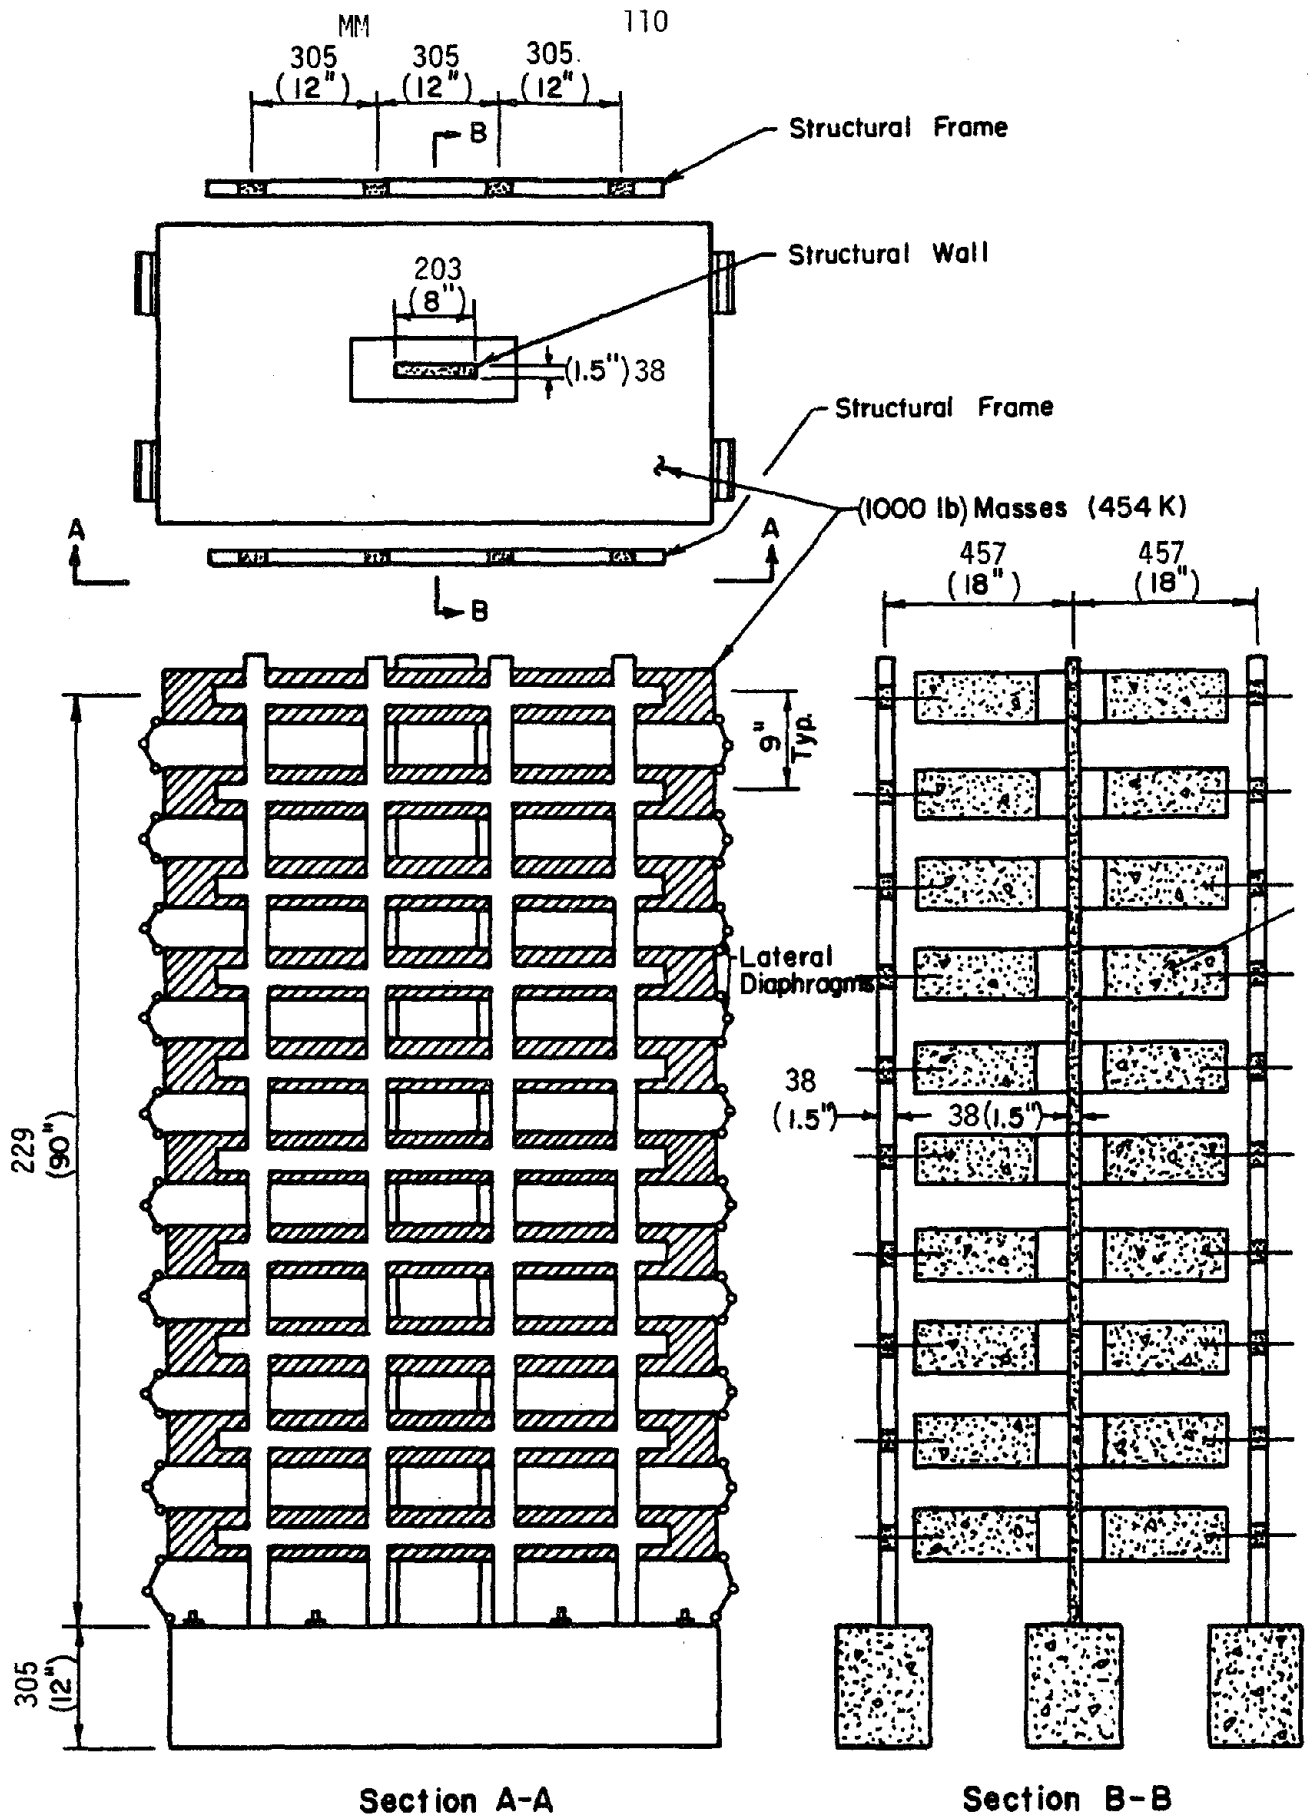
REINFORCED CONCRETE FRAME-WALL TEST STRUCTURE
